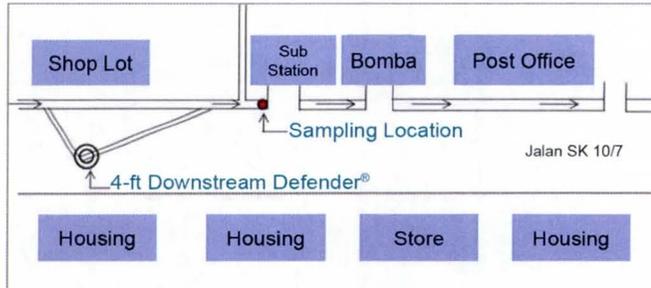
Schematic layout of Downstream Defender® installation showing sampling location.
